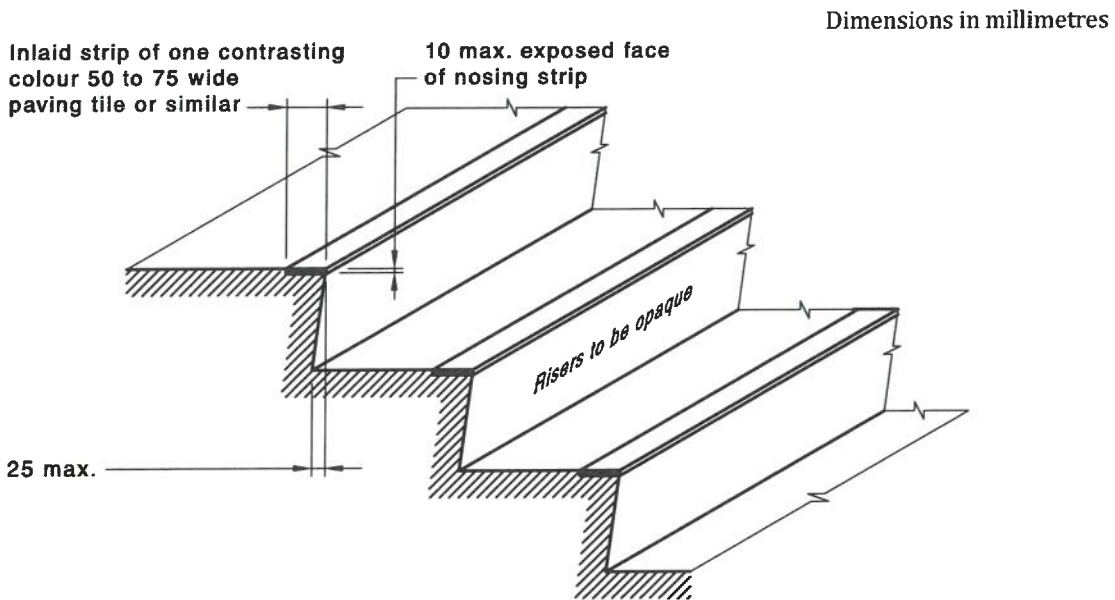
(B) — Typical stair nosing profile with exposed nosing strip
